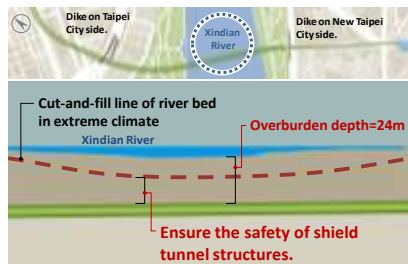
Adjust vertical alignment to keep shield tunnels safe in alternative plan
